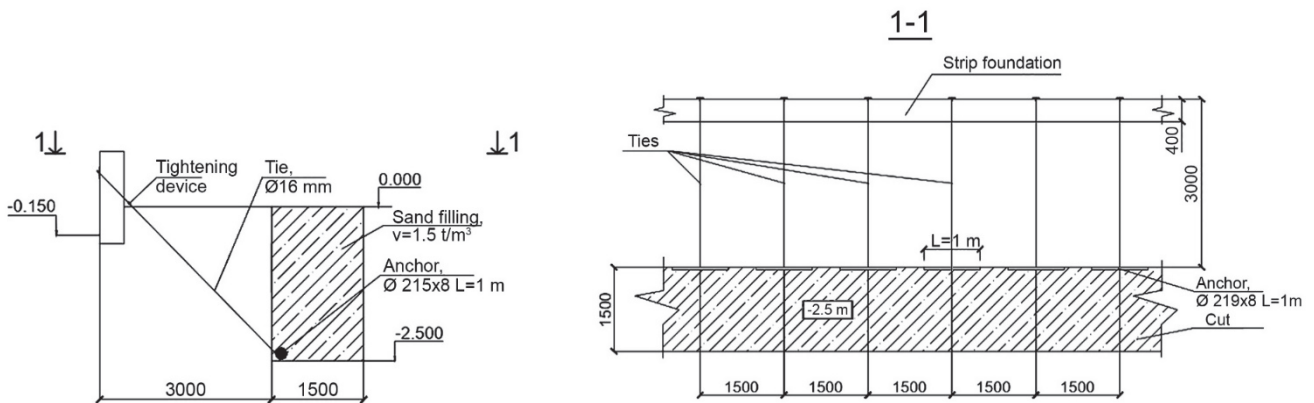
Method 2. Installation of tie-beams in the strip foundation of an arched building with steel pile anchors
